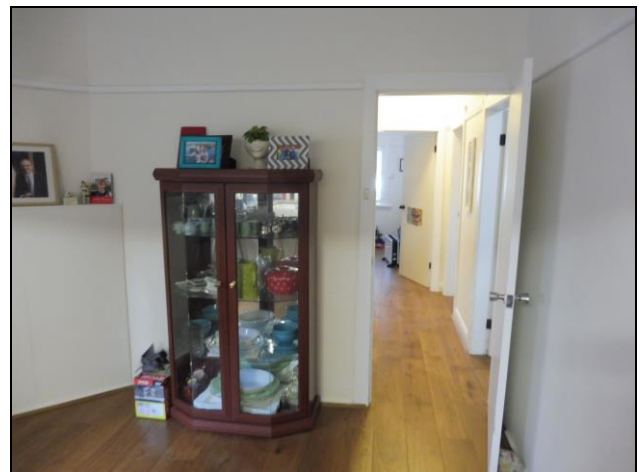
A large opening has been made in the rear wall to access the modern kitchen and rear wing.
